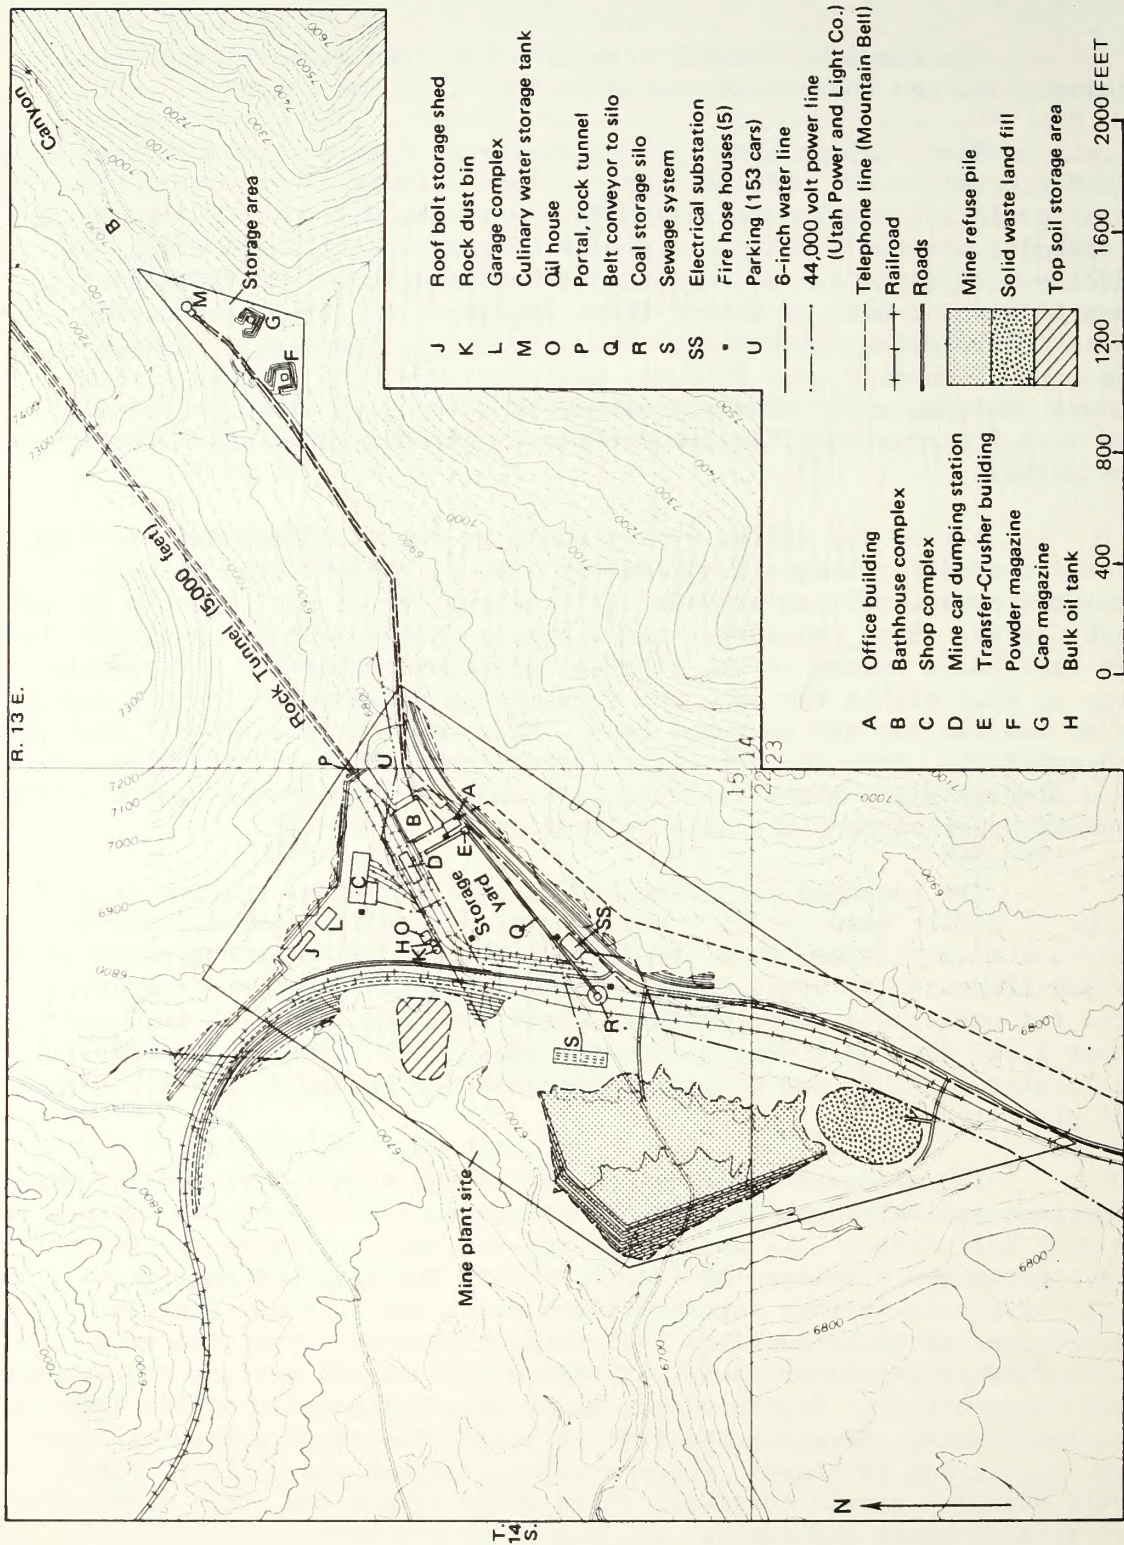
Map showing proposed surface facilities at mine plant and storage area.
